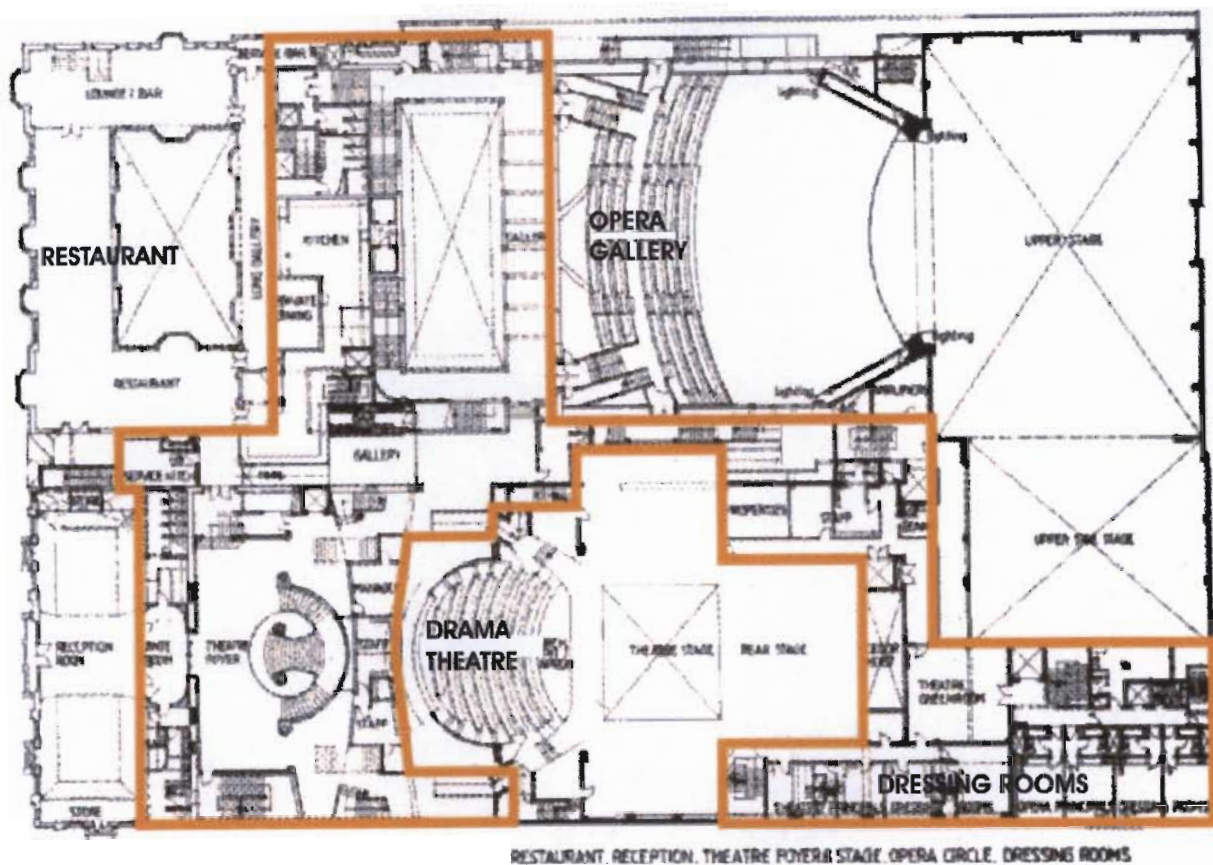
Playhouse Second Floor Plan (Peters, 1983)
